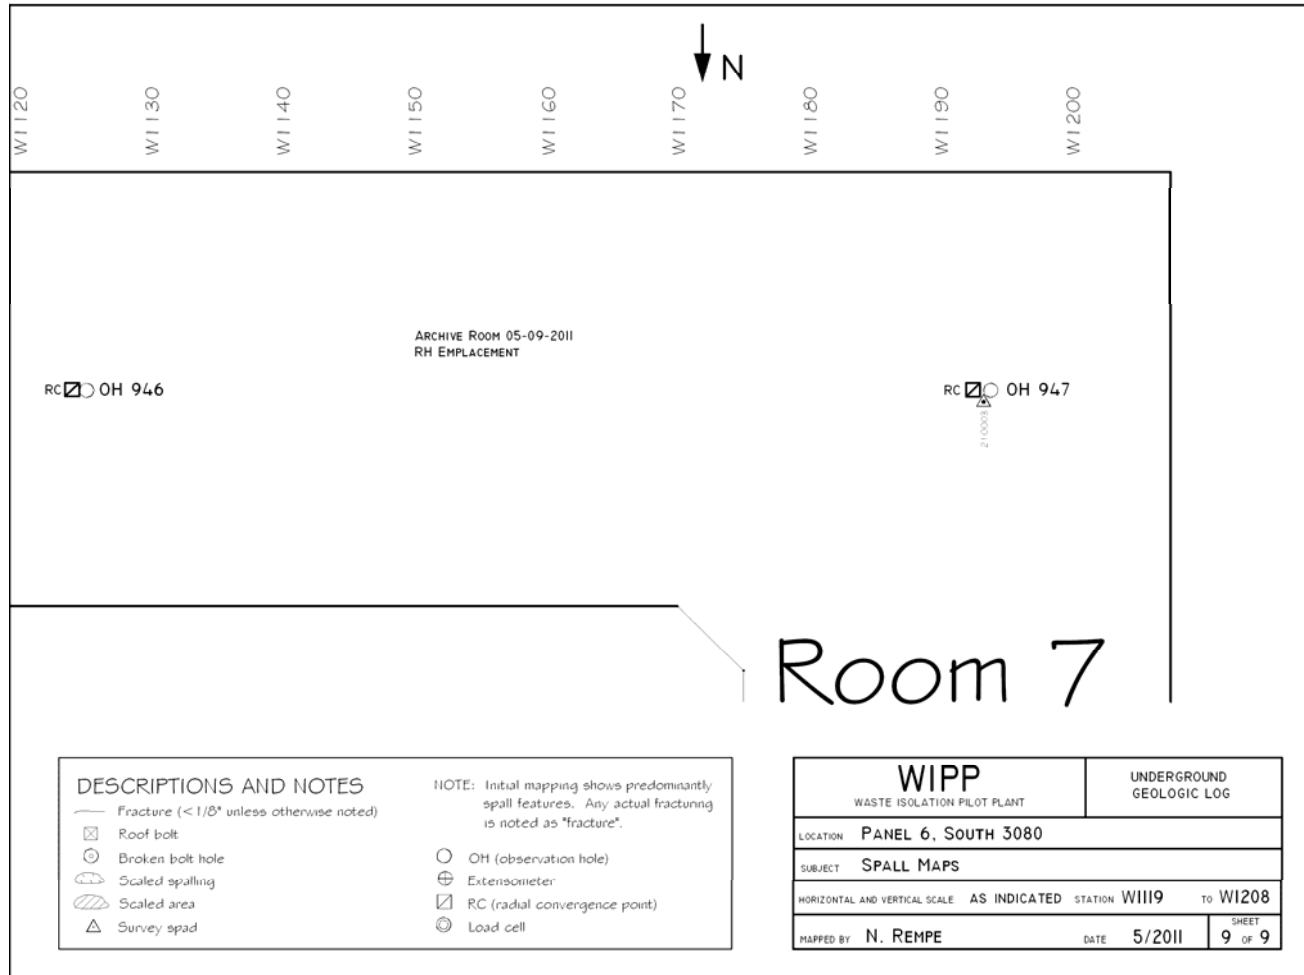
Panel 6 S3080, W390-W1210 Roof Fractures (Sheet 9 of 9)
